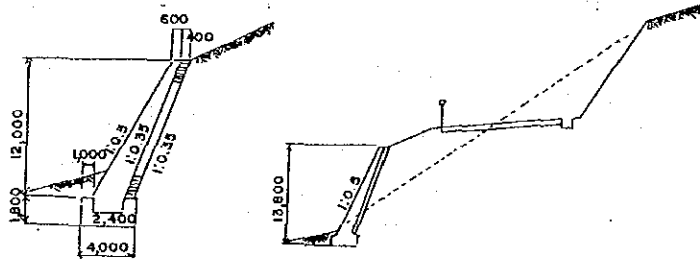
SUPPORTED TYPE RETAINING WALL
